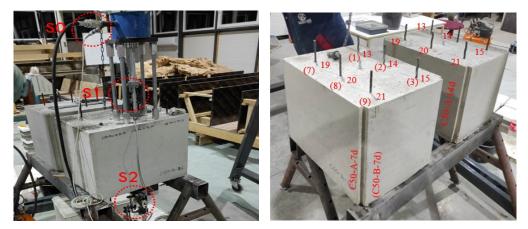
Test arrangement and position of the sensors (left) and concrete specimens with numbering (right)
